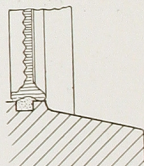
Section of cellar light and stall-board supported by structural beam.
